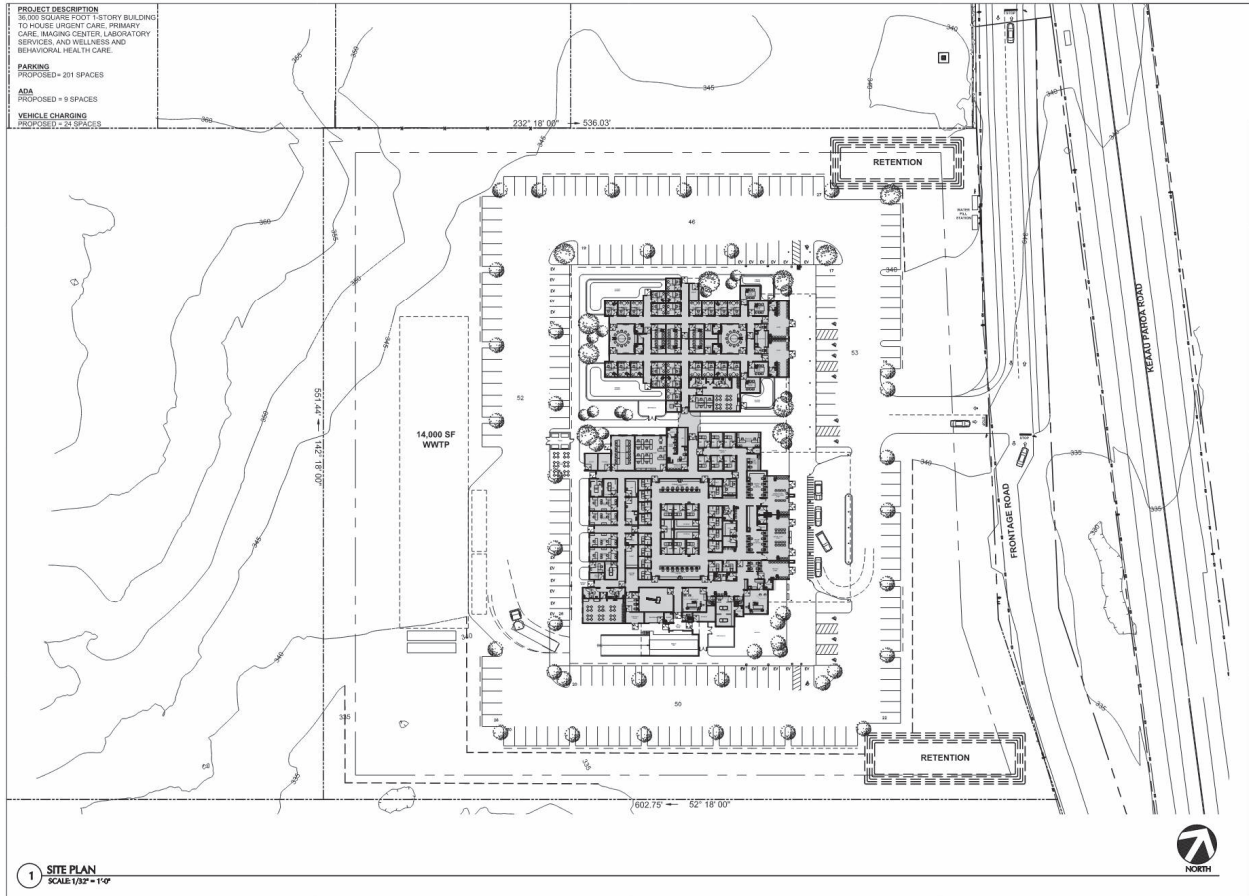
Conceptual Site Plan with Alternative 1 Driveway Alignment
